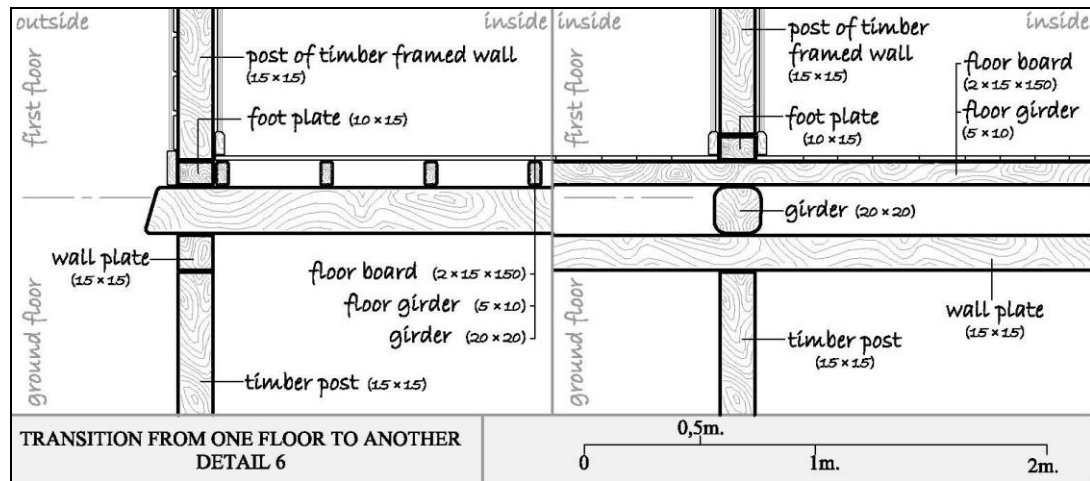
, Detail of use of timber post in the lower floor and timber frame wall in the upper floor; placement of the foot plate of the timber frame wall on girder (left), placement of the foot plate of the timber frame wall on floor girder (right)
